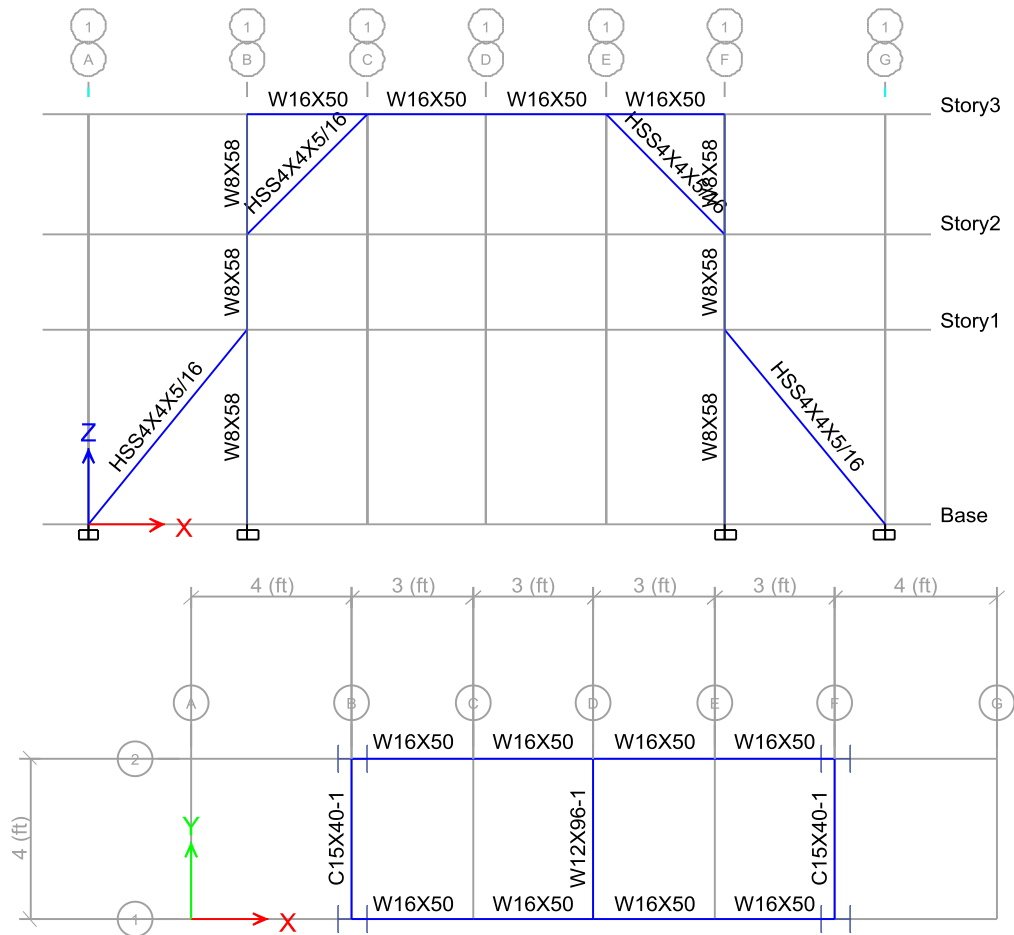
Dimensions and the cross-sections of the reinforced frame.
